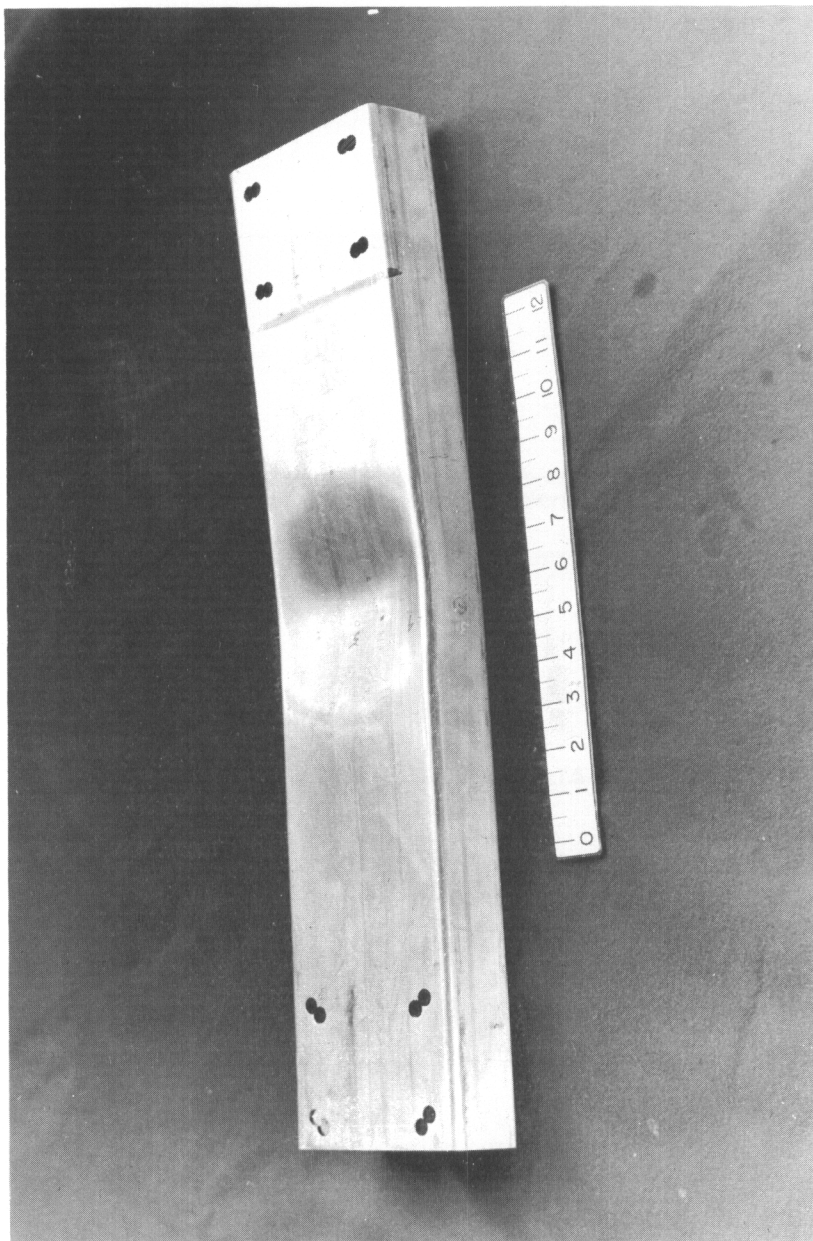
TYPICAL BOX-BEAM MODEL AFTER TESTING
